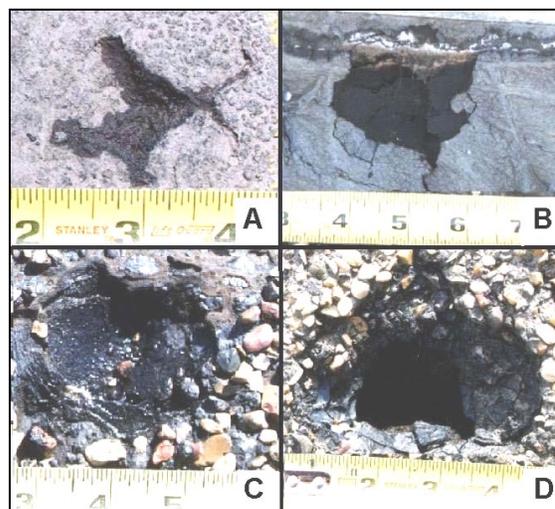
Hail damage forms on built-up roofs: a) star-shaped fracture in bare area, b) punctured flashing, c) punctured blister, and d) puncture in field of roof that went through the wood roof deck.
